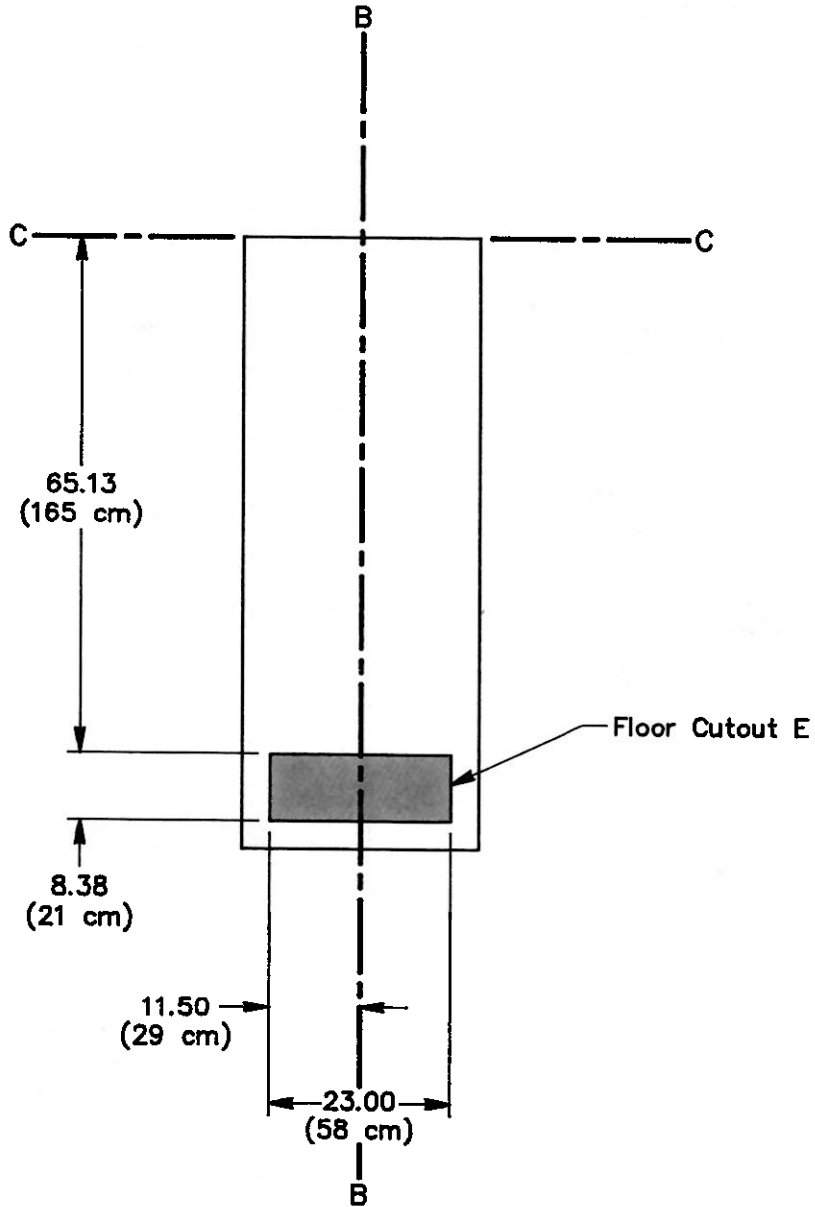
Location and Dimensions of MFC Floor Cutout E
